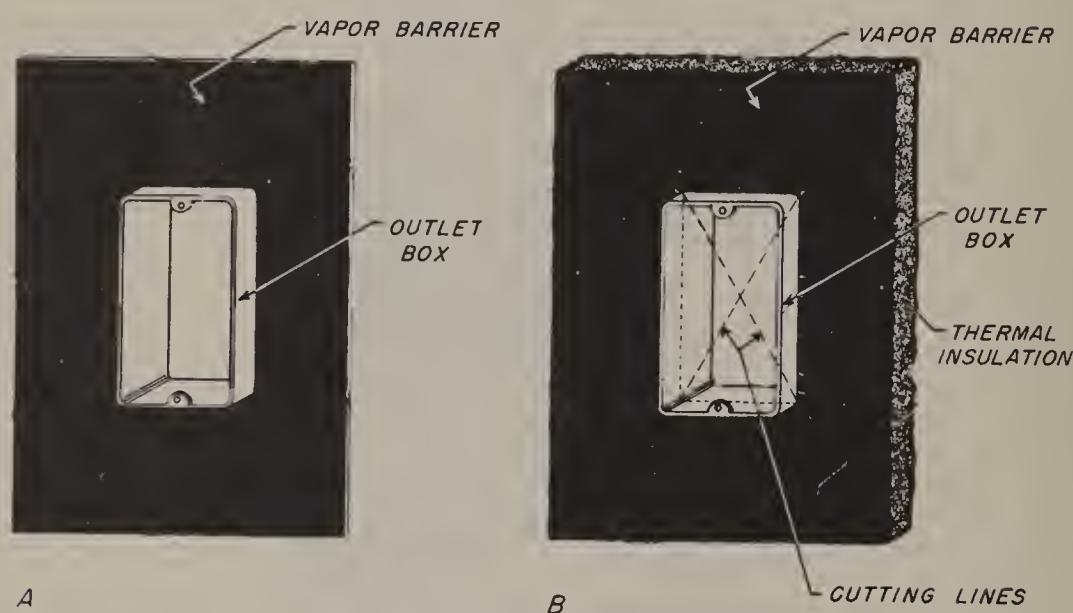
Fitting vapor barrier around electric wiring outlet box.* Vapor barriers should be well fitted around electric switch and outlet boxes to prevent water vapor leakage into the wall. The paper should be stapled to the wood structure and laid over the outlet box, and in this position can be broken or cut by striking it above the edge of the box with a hammer so as to crush or break the paper (A). It could also be cut along the edge of the box with a sharp knife. The barrier should be pushed over the edge of the box without tearing it. No more openings should be made in the outlet box by the electrician than are actually needed thus preventing vapor flow through the box itself. Blanket insulation with a vapor barrier attached may be cut diagonally over the box, most of the fiber between the covers should be removed and the corners tucked down at the sides of the box (B).
